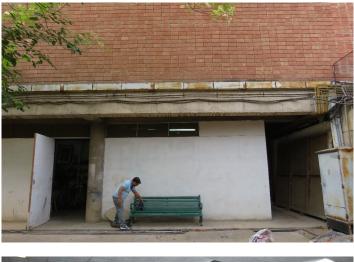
Objects Exposed electrical wiring and conduit casing disfiguring the building façade
